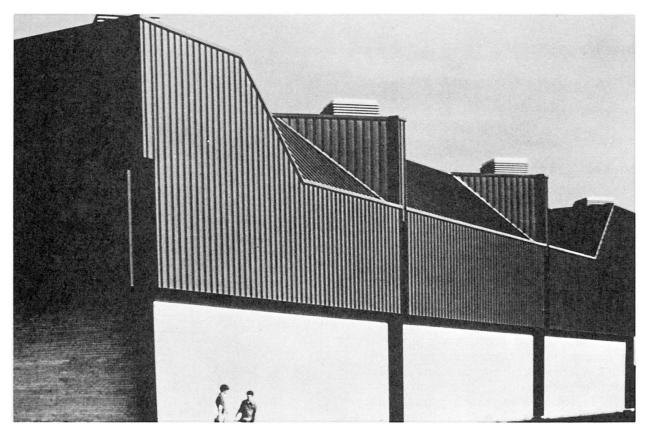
Architectural Use of Cold-Formed Steel Panels in School Building
